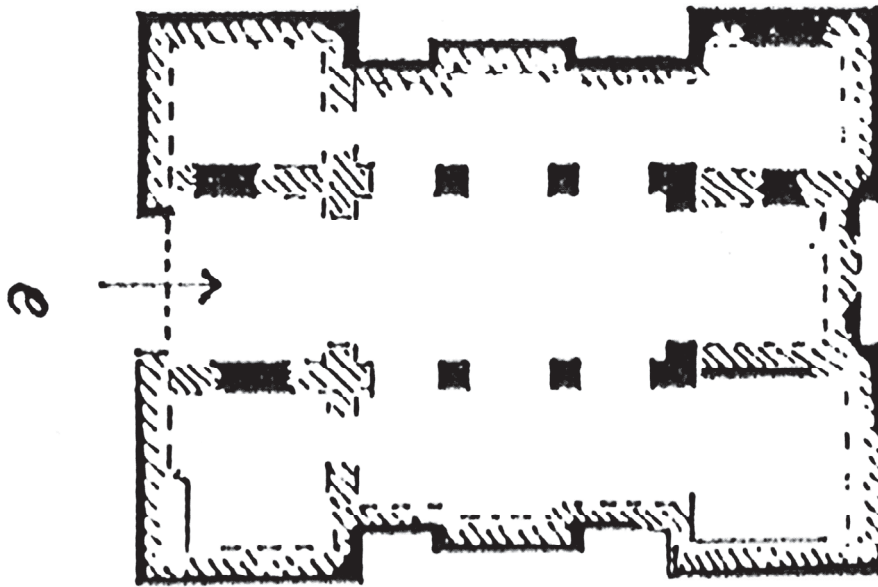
Church of Qohayto, Akkälä Guzay, Eritrea, floor plan; from Buxton, after Krencker
